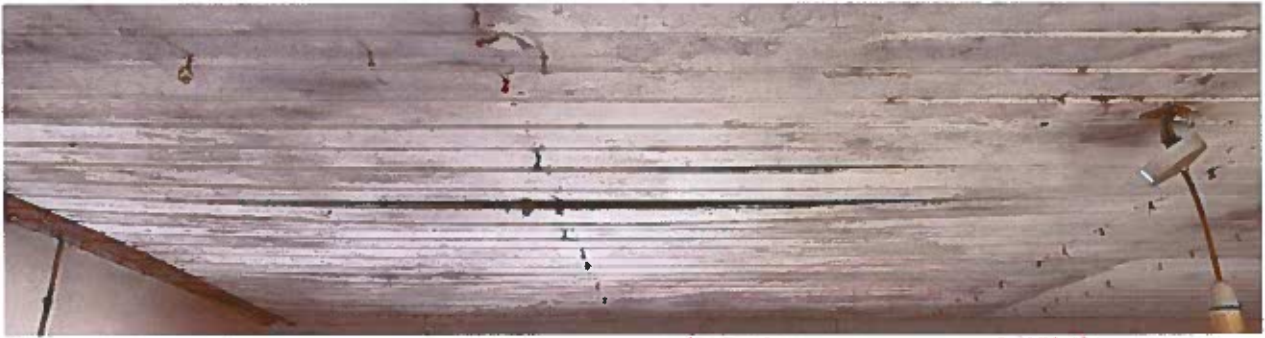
The ceilings are in a poor condition generally and will need repairing.
